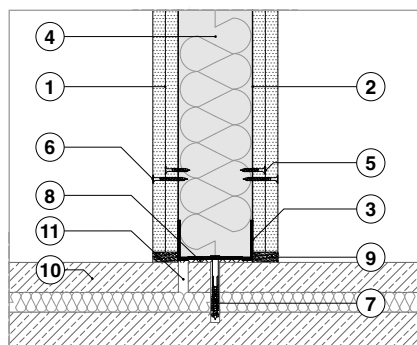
Connecting a partition wall with dry screed floor with an acoustic gap
